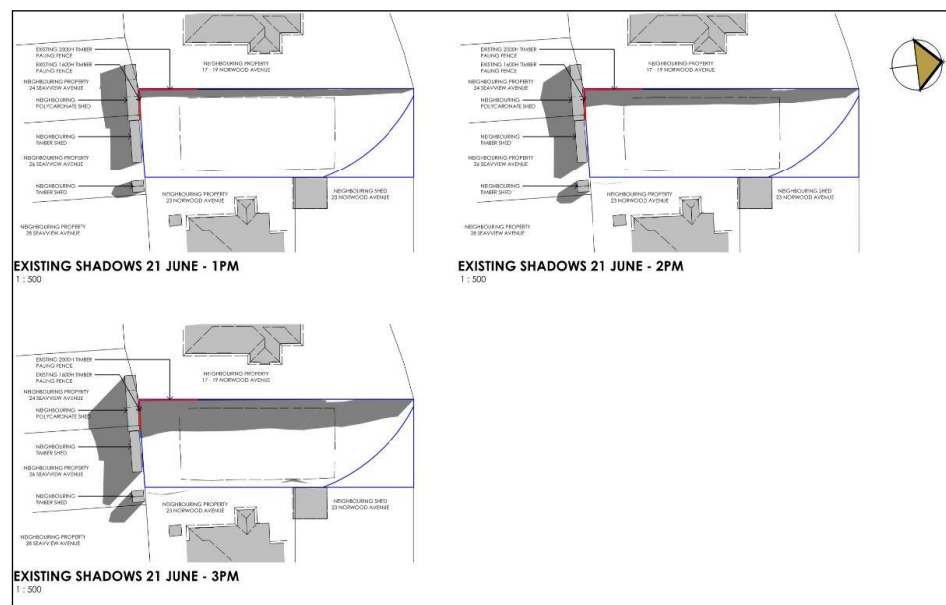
Existing overshadowing caused by the boundary fence and timber structures on the adjoining lots between 1pm to 3pm.
